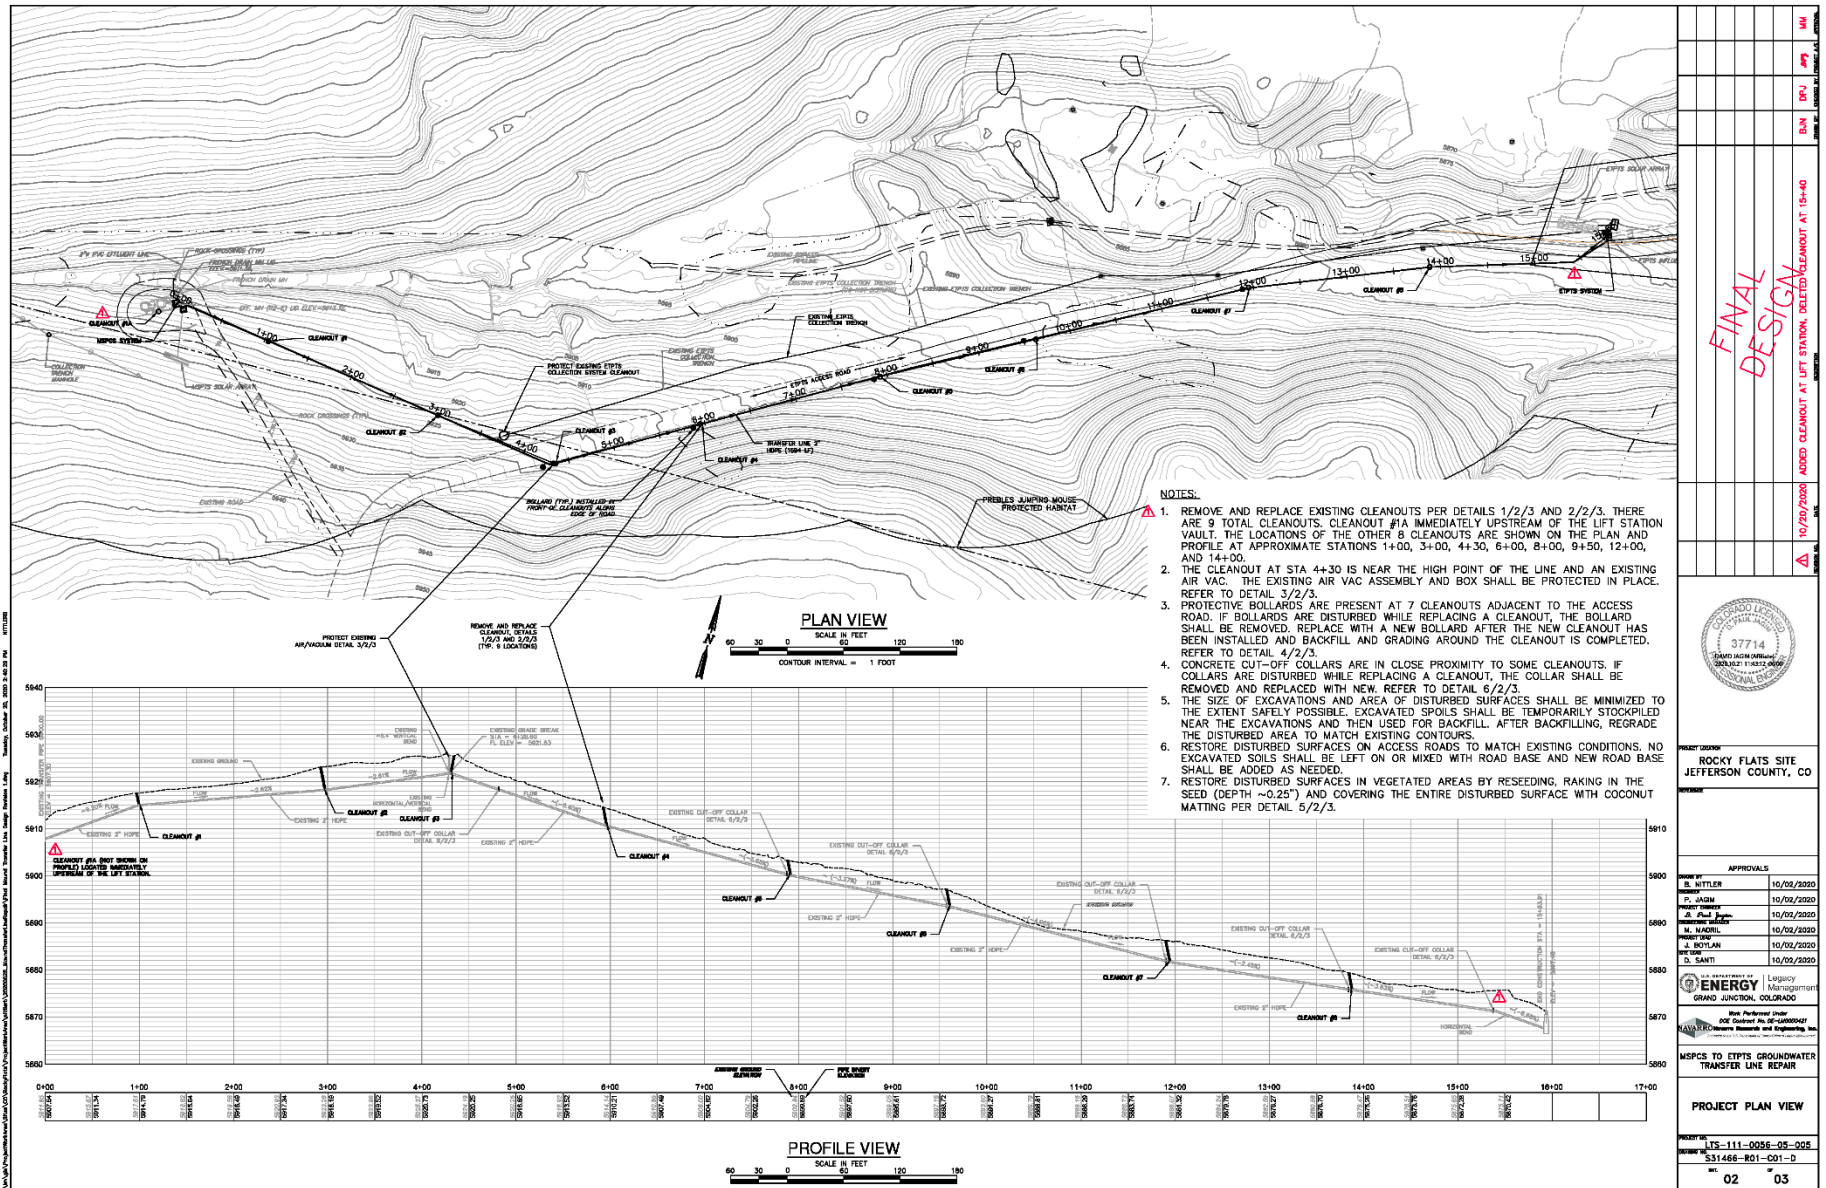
Figure 3 MSPCS Transfer Line Plan and Profile View
